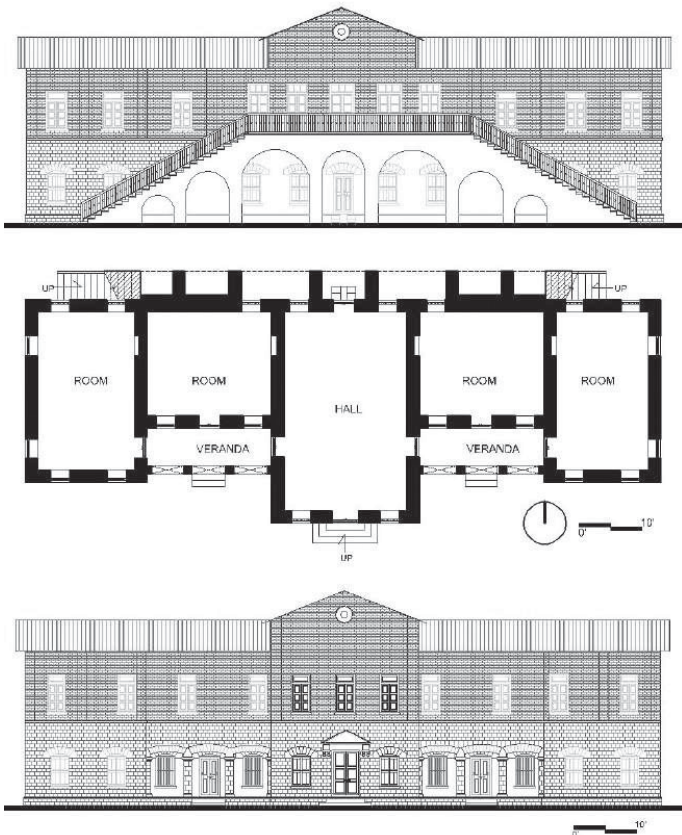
Maratha Shikshan Mandal, 1920s: North Elevation, Ground Floor Plan & South Elevation
